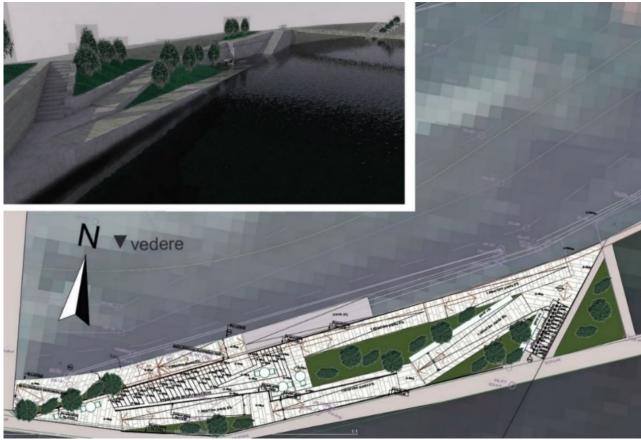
Detail- The area downstream of the pedestrian bridge, stairs/ ramps for accessibility to the watercourse.⁶⁹
